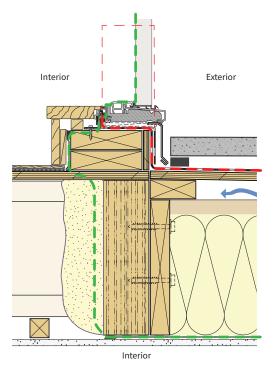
Vented roof deck (flat roof FR-3) with offset framing, roof membrane from the deck up into the door sill (red dash), and interior air barrier (green dash).
